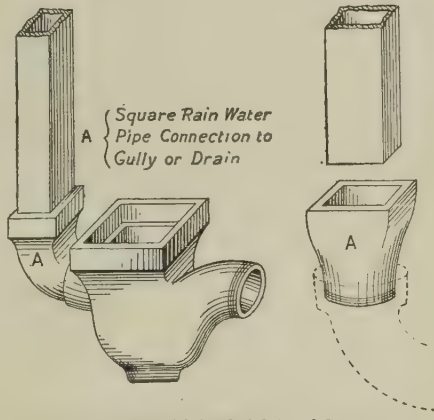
Gully with Back Inlet and Connections to Rectangular Rainwater Pipe
